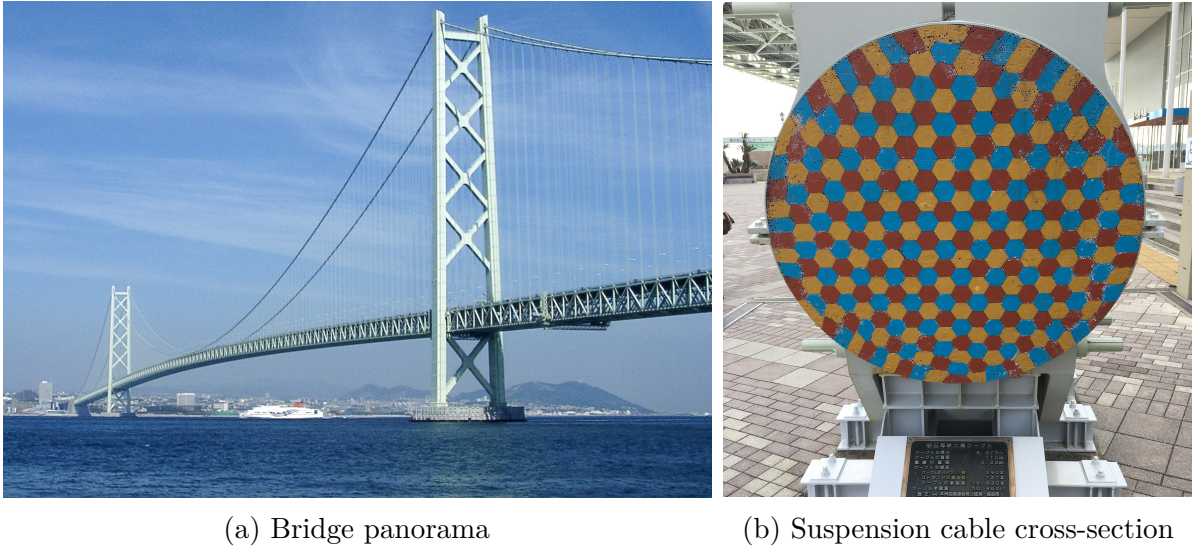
Akashi Kaikyo Ohashi bridge, cc-by-sa-2.0
